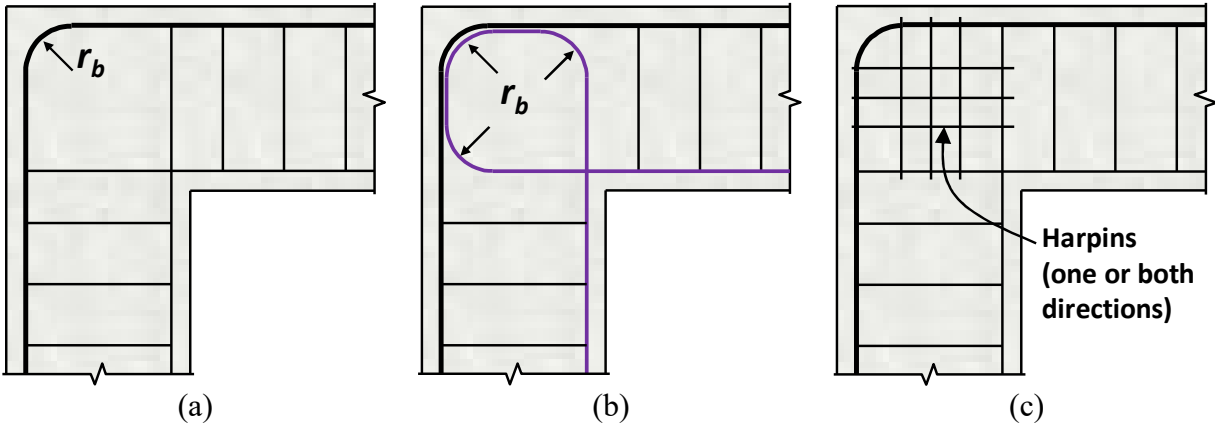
Reinforcement details (adapted from Stroband and Kolpa²³)
